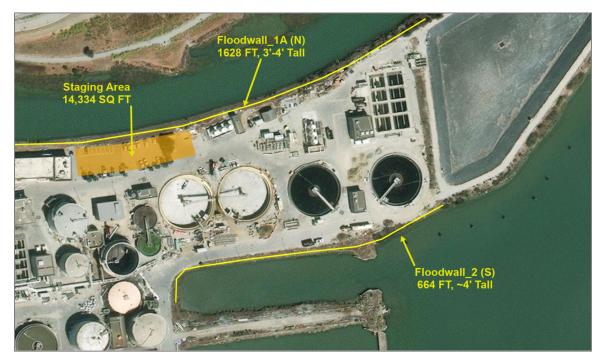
Alternative 2 also includes a shorter floodwall along the southern edge of the plant where elevations are lower, in addition to the north wall shown in Figure 3-10.
